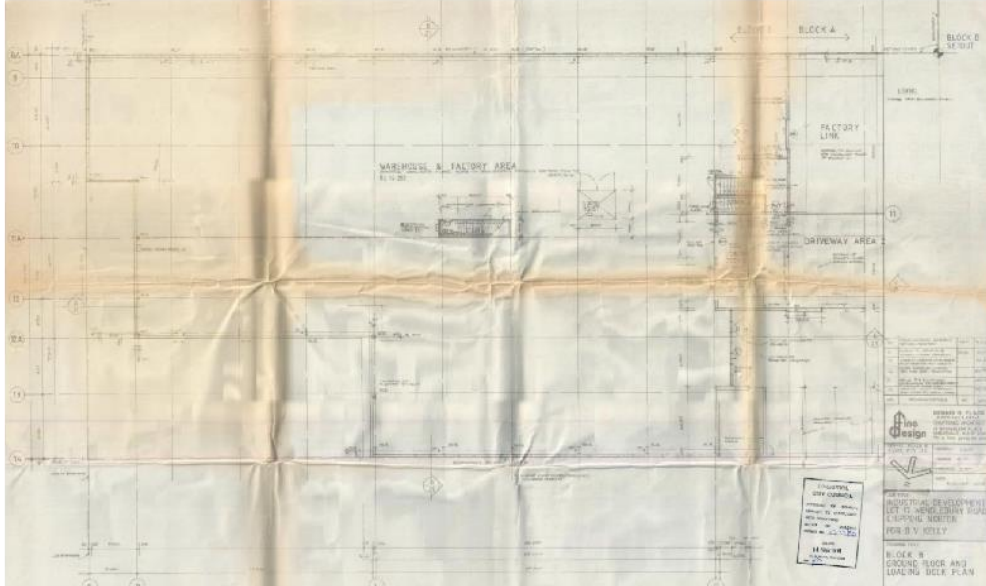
Extract of the approved block B ground floor and loading dock plan under no. 211/1990 (northern portion)
